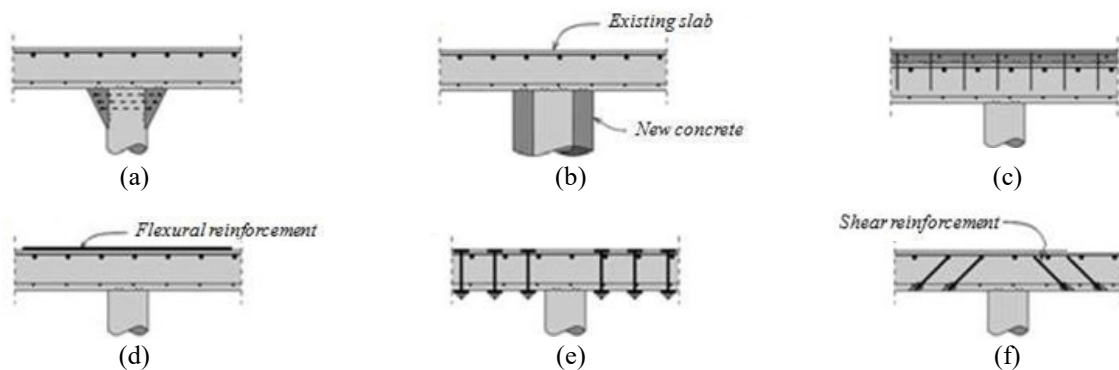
Slab strengthening: (a) creating column head; (b) column jacketing; (c) thickening the slab; (d) adding flexural reinforcement; (e) post-installed shear bolt, and; (f) post-installed shear reinforcement [22]
